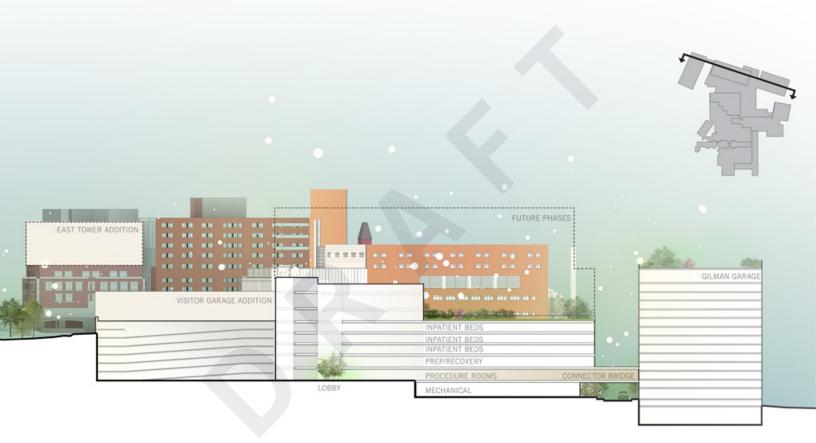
CAMPUS TRANSFORMATION PLAN
